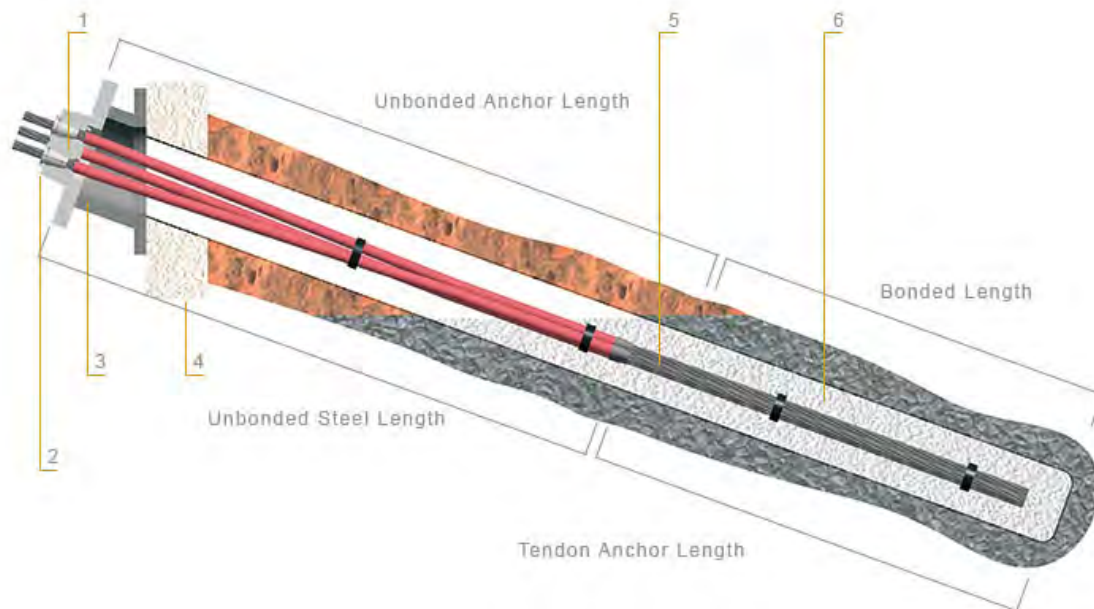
Illustration of a Typical Rock Anchor Tie-Back
